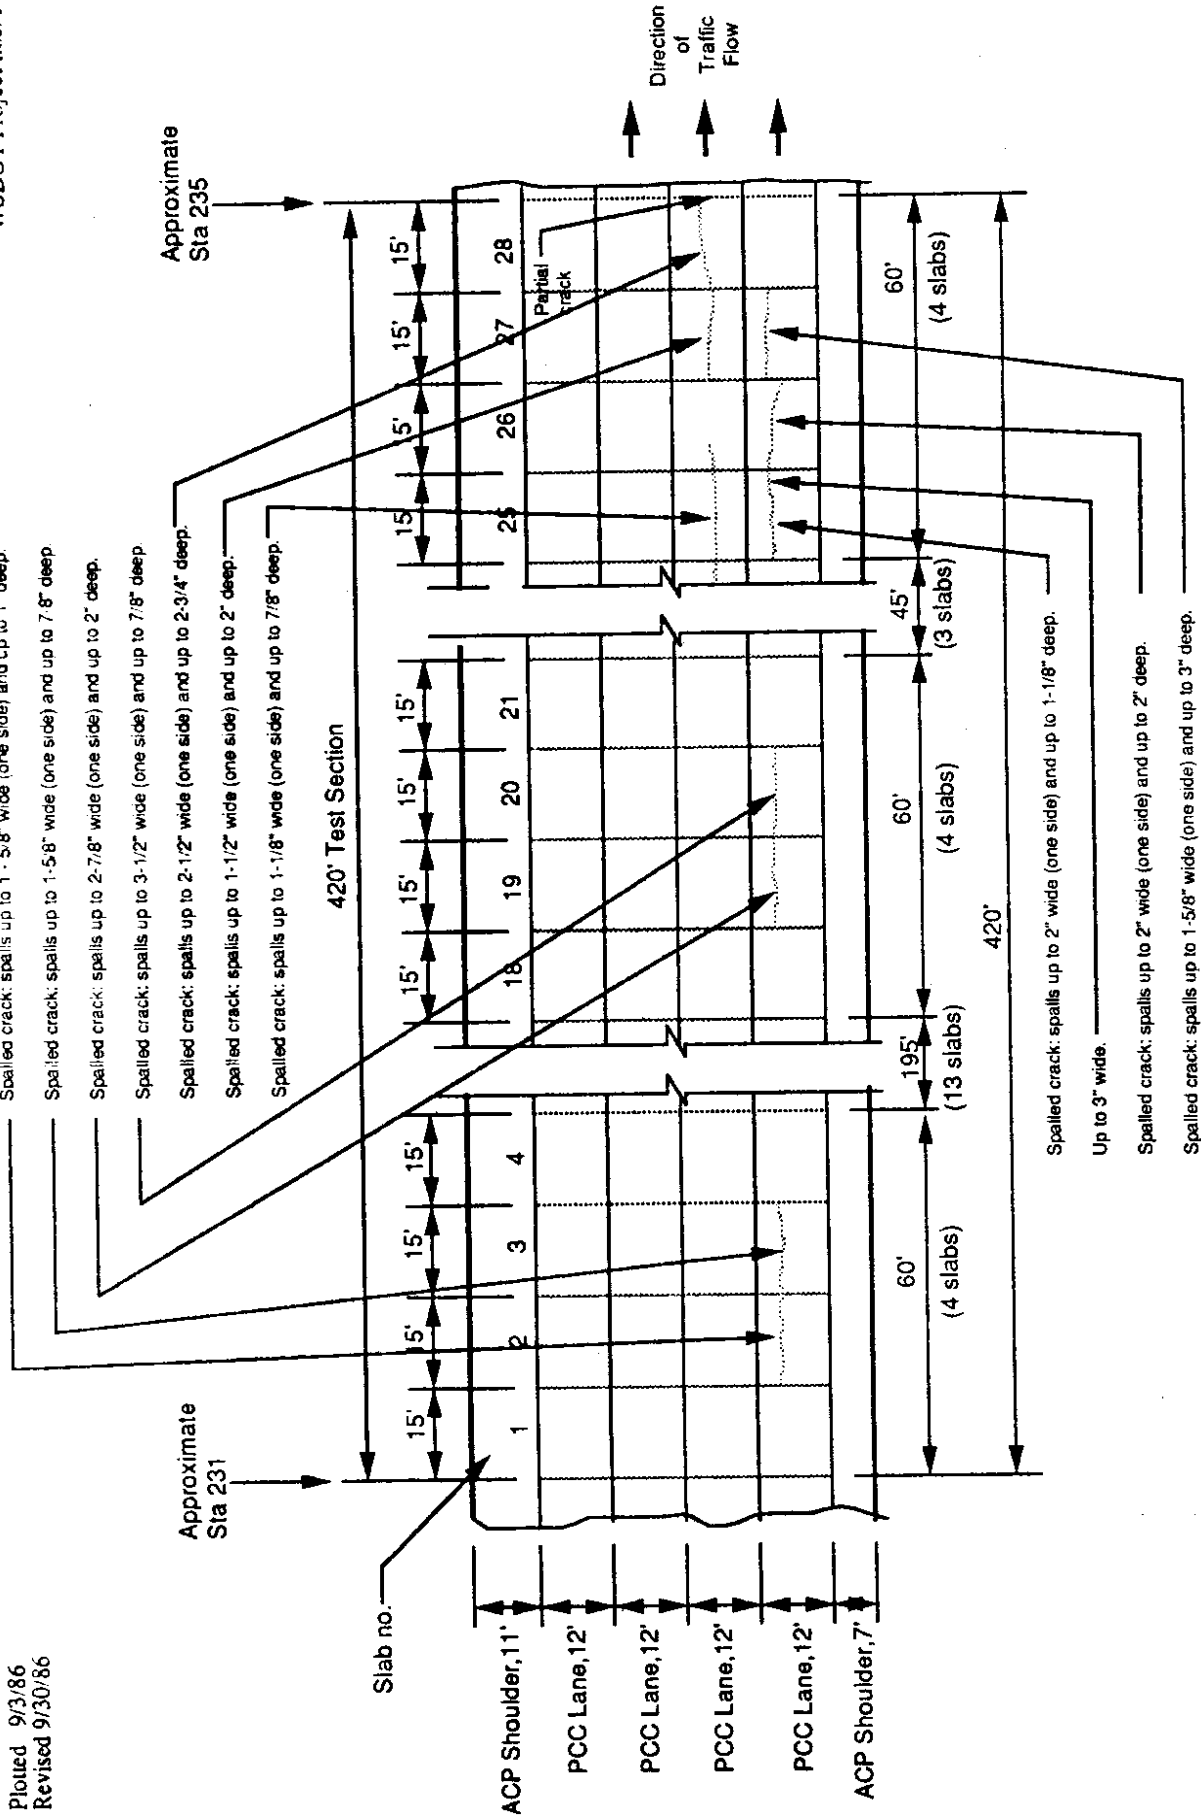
Crack Survey - Plan View, SR 5 Seattle (Northbound)
